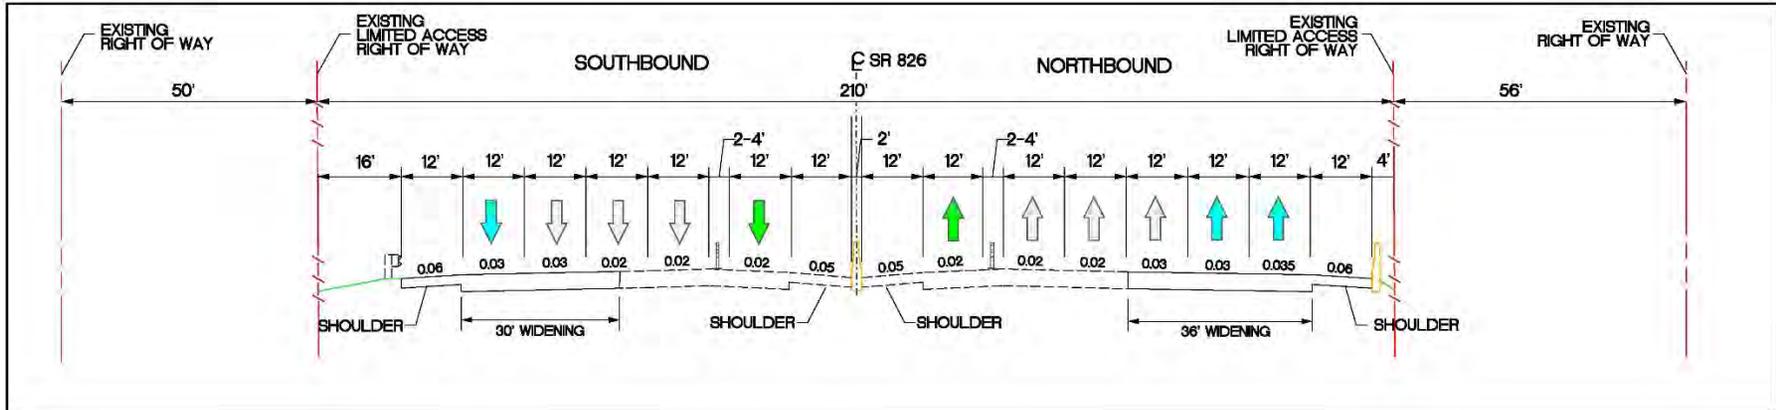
Recommended Alternative Roadway Typical Section between US 1 and SR 874
